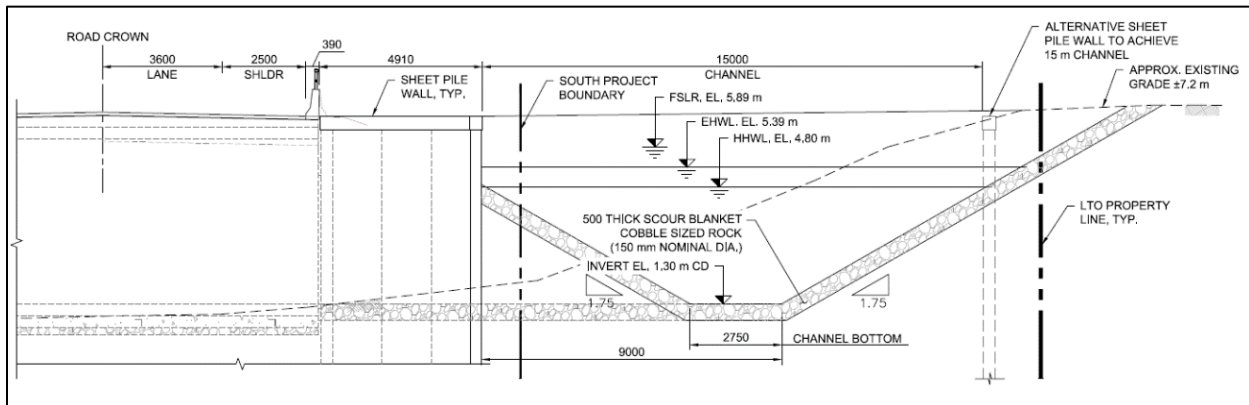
Open Channel Section Near Culvert Structure (Section B from Figure #5)
